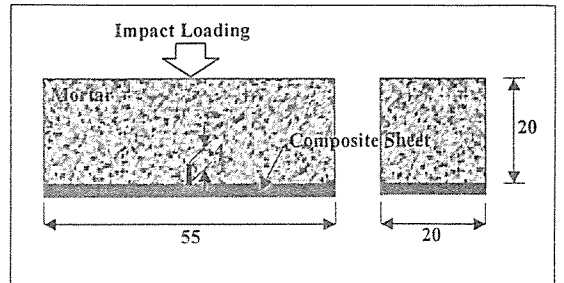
Impact Test Specimen of Composite Reinforced Mortar(in mm)
